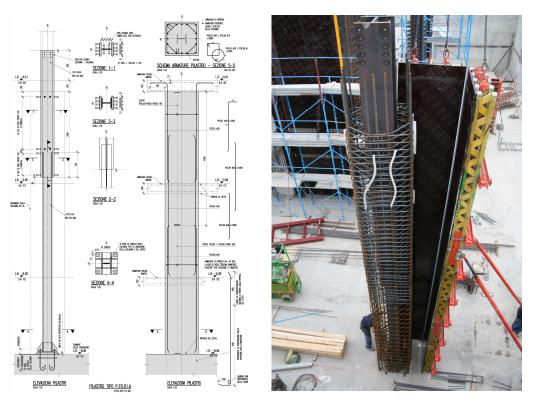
Structural detail - Load transfer steel to concrete at basement, © Arup
